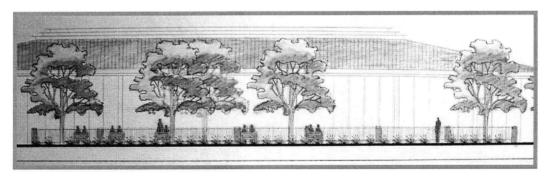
Portion of section/elevation of B-B1 showing lawn bowling area with Uji Cultural Pavilion in the background
